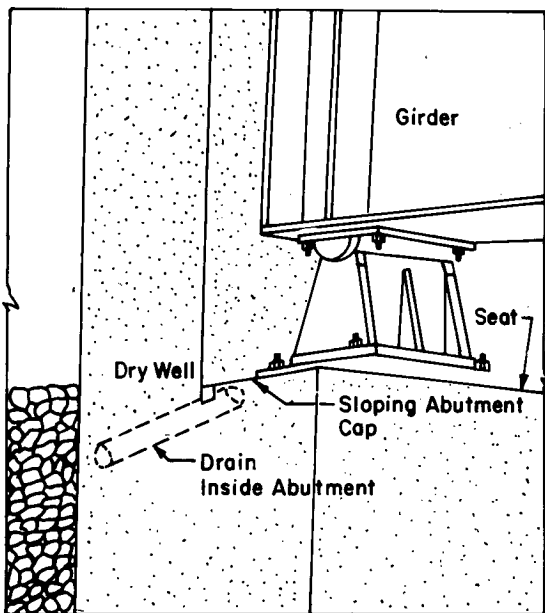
Sloping abutments and piers with drain. [Bethlehem 1983]
